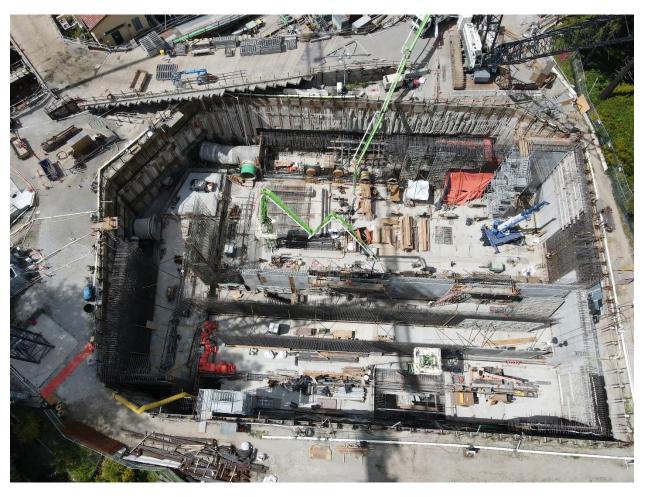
Aerial view of the UV-CCB excavation pit with the underground structures starting to take shape. The foundation for structures are 65-feet below the ground surface.
